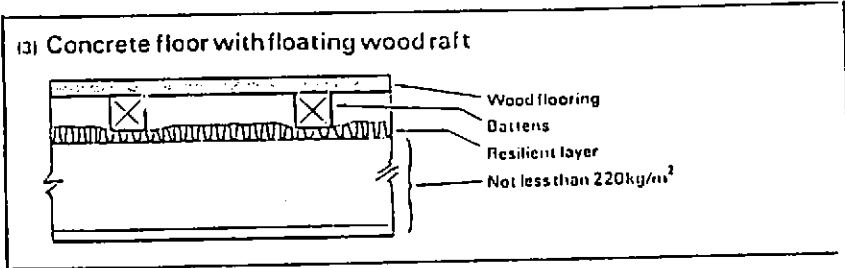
Detail of Concrete Floor With Floating Wood Raft (ref 3)
